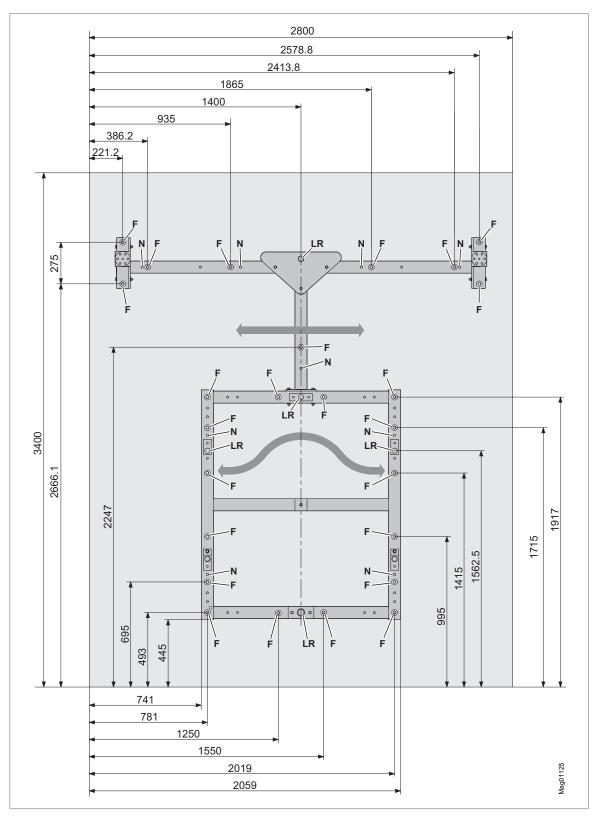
Foundation and empty conduit plan for base frame FURA-B (MPB "Standard" without optional roof) – top view (dimensions in mm) F, LR and N: ✓ Page 39, Table 8
